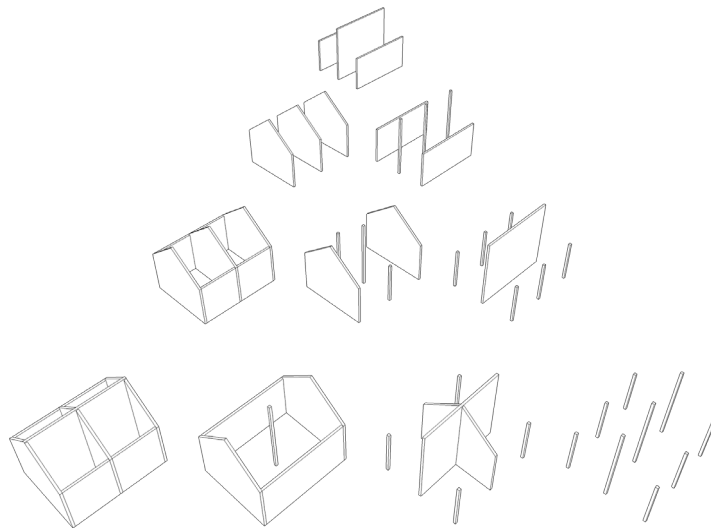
Relation between space and structure; composition of structural elements show a wide variety of possibilities to construct a single building form, here a rectangular plan with gable roof. After Sackman (1988).
